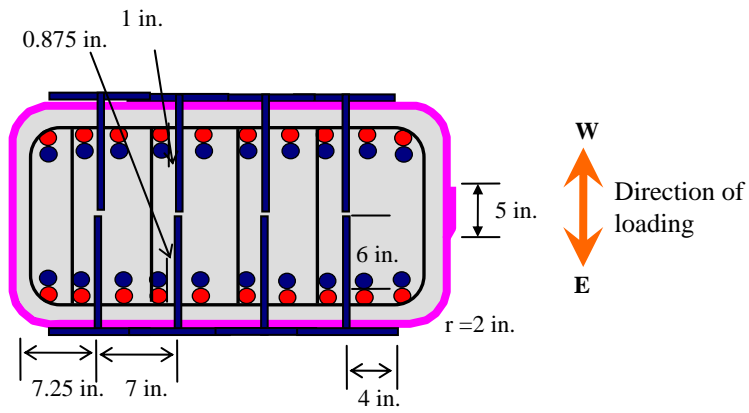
Layout of the CFRP jackets and CFRP anchors, 4-C-R20-M
